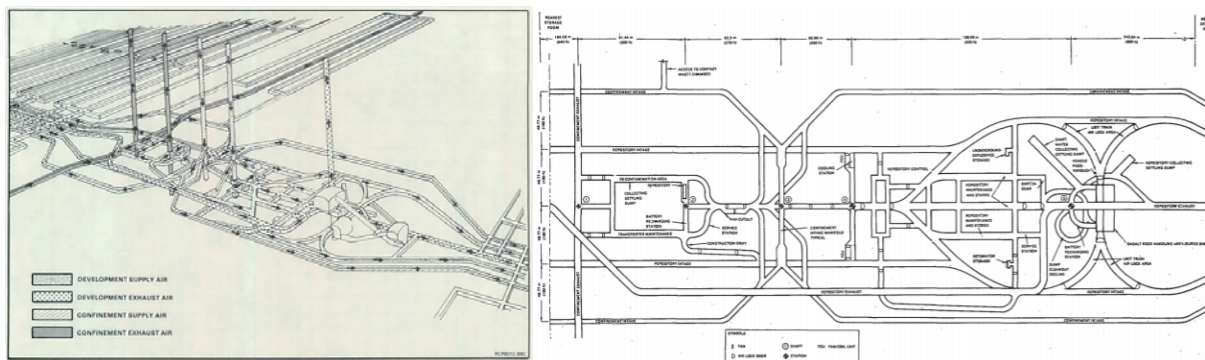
Basalt Waste Isolation Project to evaluate the feasibility of Hanford Site as a high-level waste disposal site (Left, potential ventilation system; Right, shaft-pillar layout)
